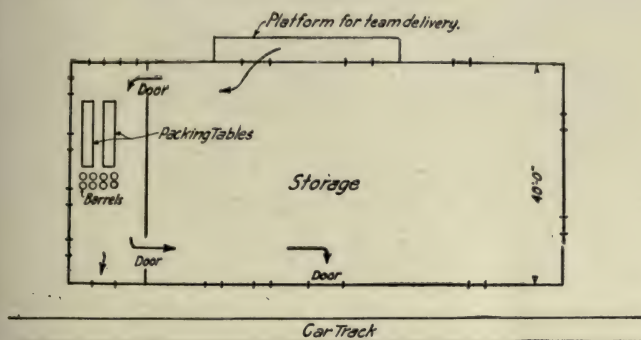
USUAL FLOOR PLAN OF PACKING HOUSES. ARROWS SHOW HANDLING OF APPLES IN PACKING. PACKING ROOM GENERALLY PLACED WITH SOUTH OR SOUTHEAST EXPOSURE TO SECURE GREATEST AMOUNT OF LIGHT
